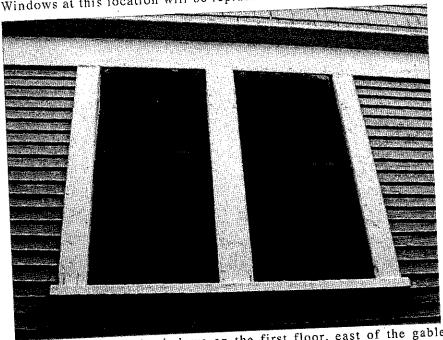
4-over-1 windows on the first floor, east of the gabled bay on the south elevation. Windows at this location will be replaced in kind.
